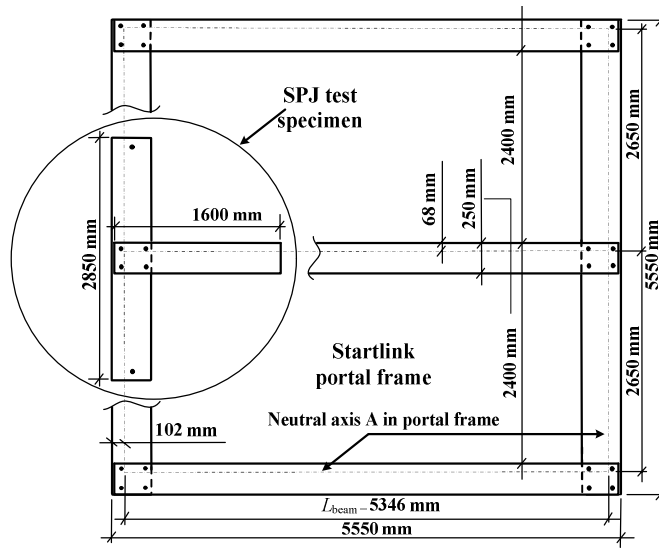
Startlink portal frame with specimen SPJ for external frame joint at first floor level.
